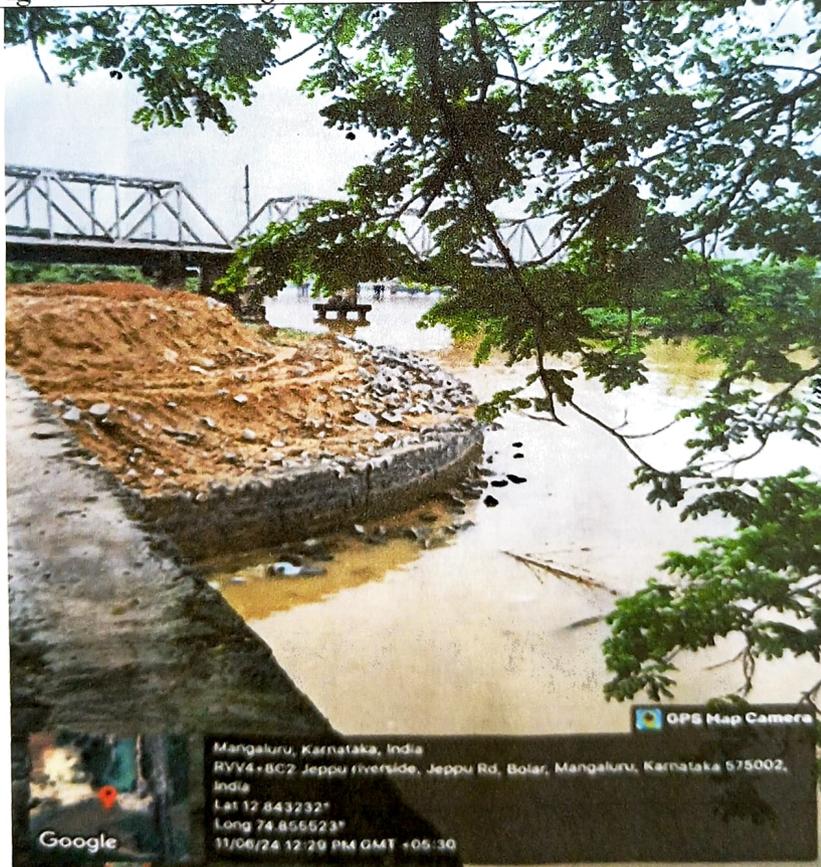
Photo showing the removal of unauthorized Construction near railway bridge
